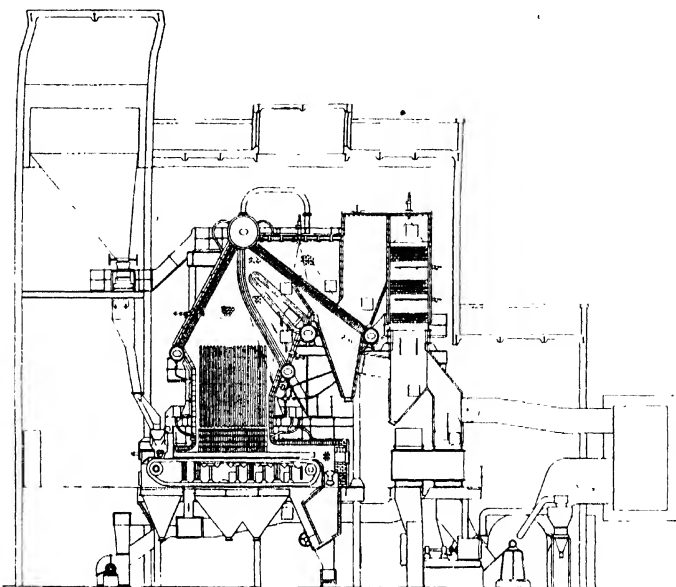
HORIZONTAL ARRANGEMENT OF BOILER EVAPORATION: M.C.R. 100,000 LB. PER HOUR
